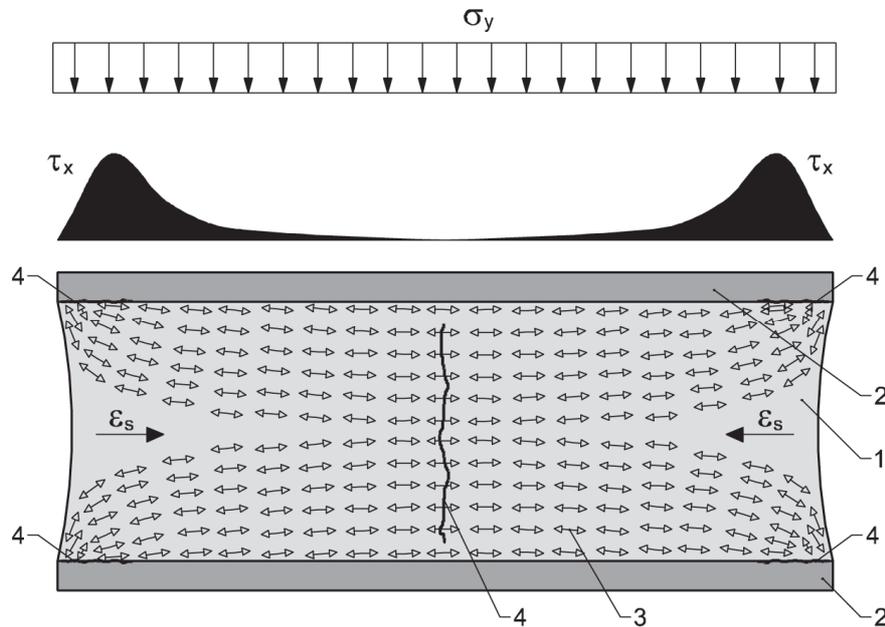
Analyzed wall-ceiling model, according to [4]: 1 – wall, 2 – concrete ceiling, 3 – masonry tensile stresses, 4 – possible cracking
